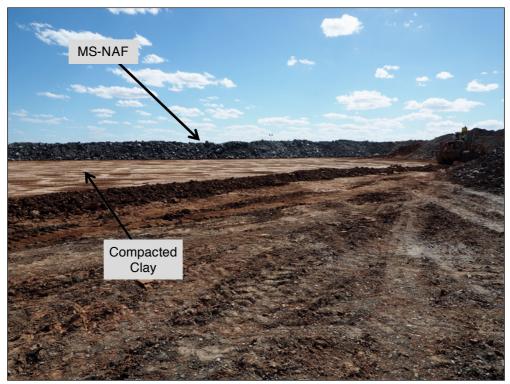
Construction of MS-NAF Halo Zone on the South Side of the NOEF
